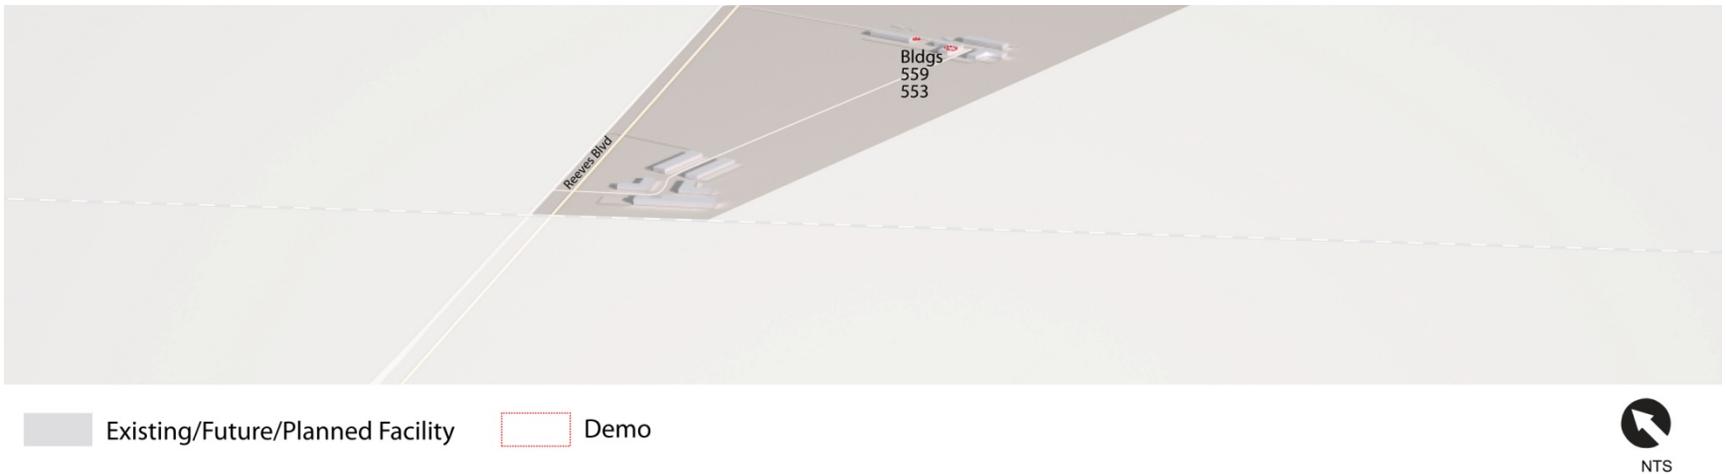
JOINT USE TRAINING DISTRICT DEMOLITION PLAN
